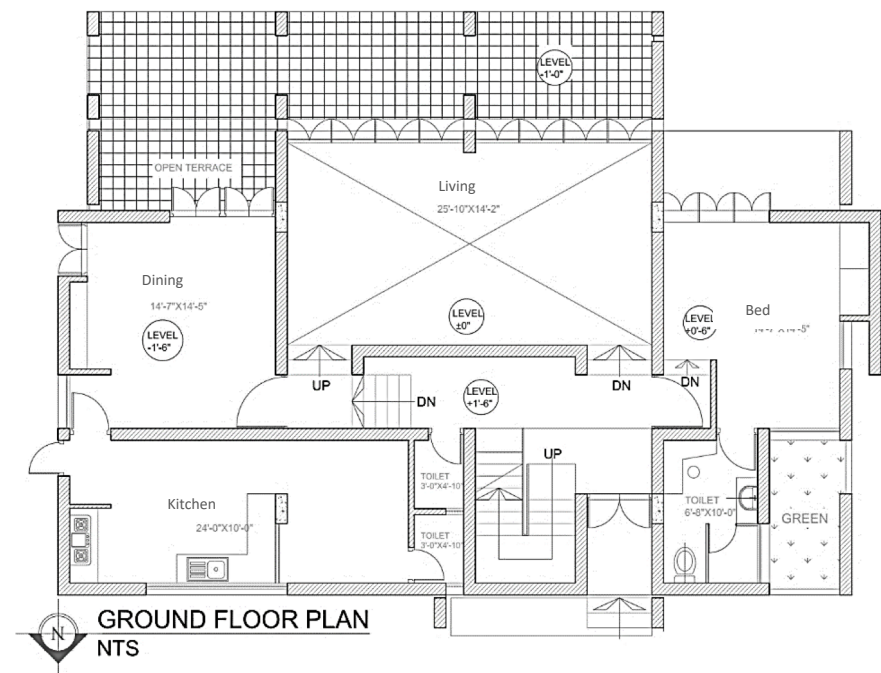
Ground floor plan of Architect Mazharul Islam's residence
